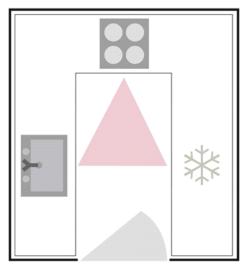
Layout Plan of U-Shaped Kitchen
